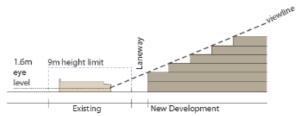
New development adjacent to existing residential - rear boundary with laneway
